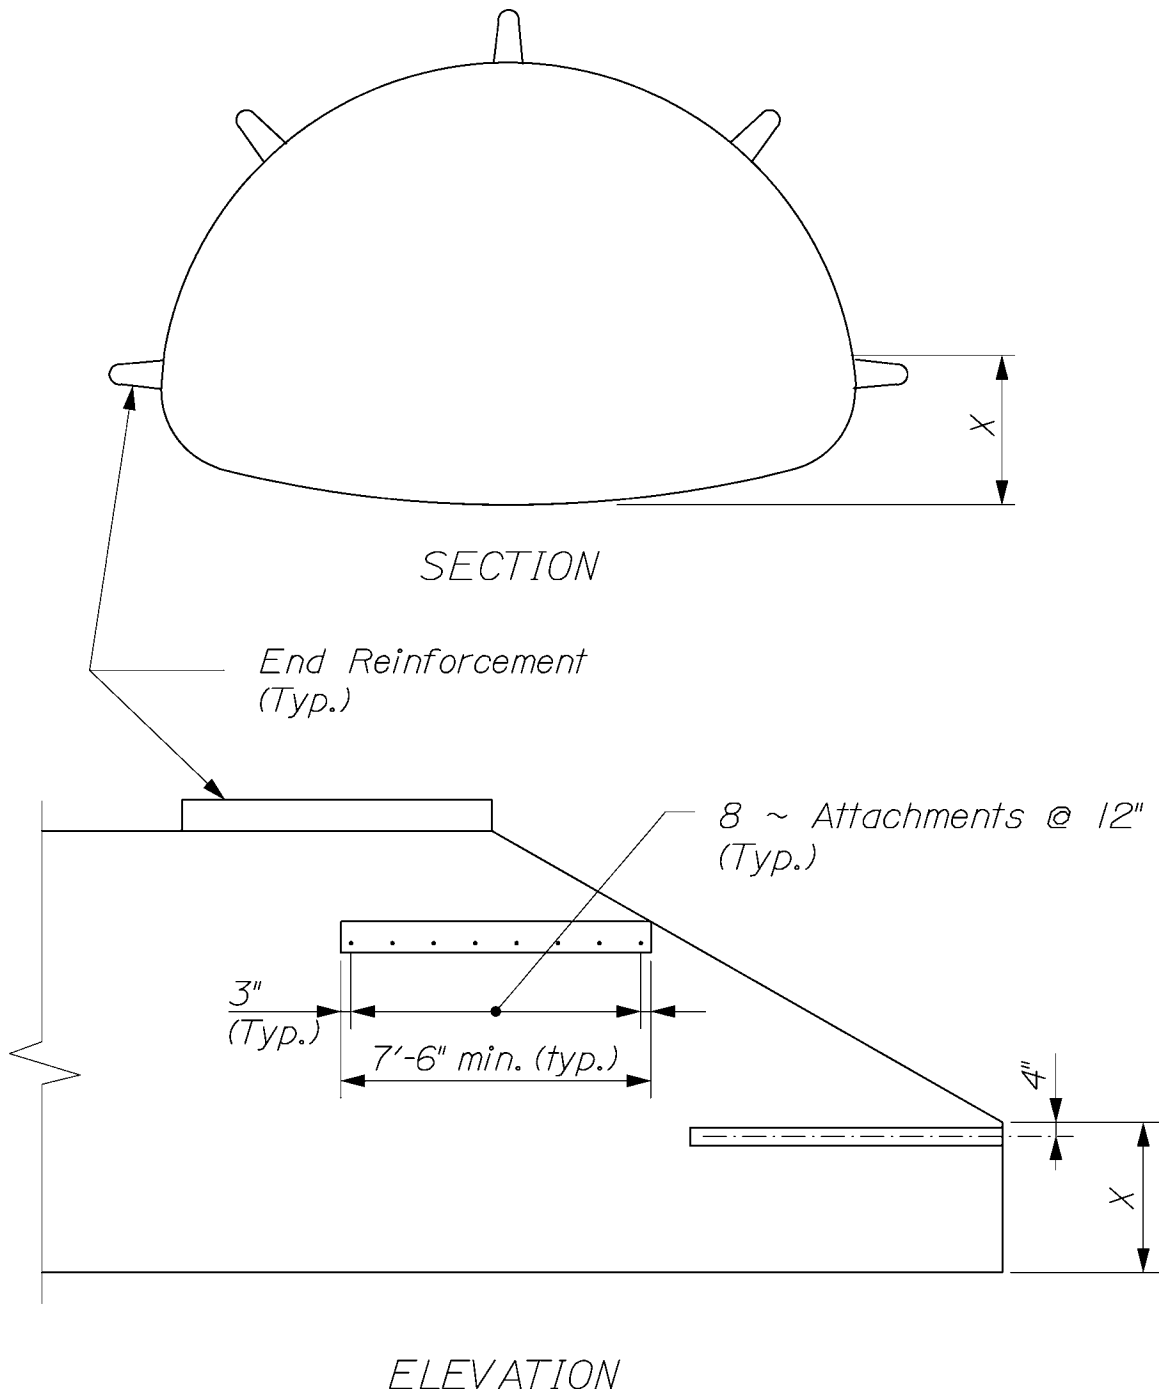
End Reinforcement of Aluminum Pipe or Pipe Arch Structures
